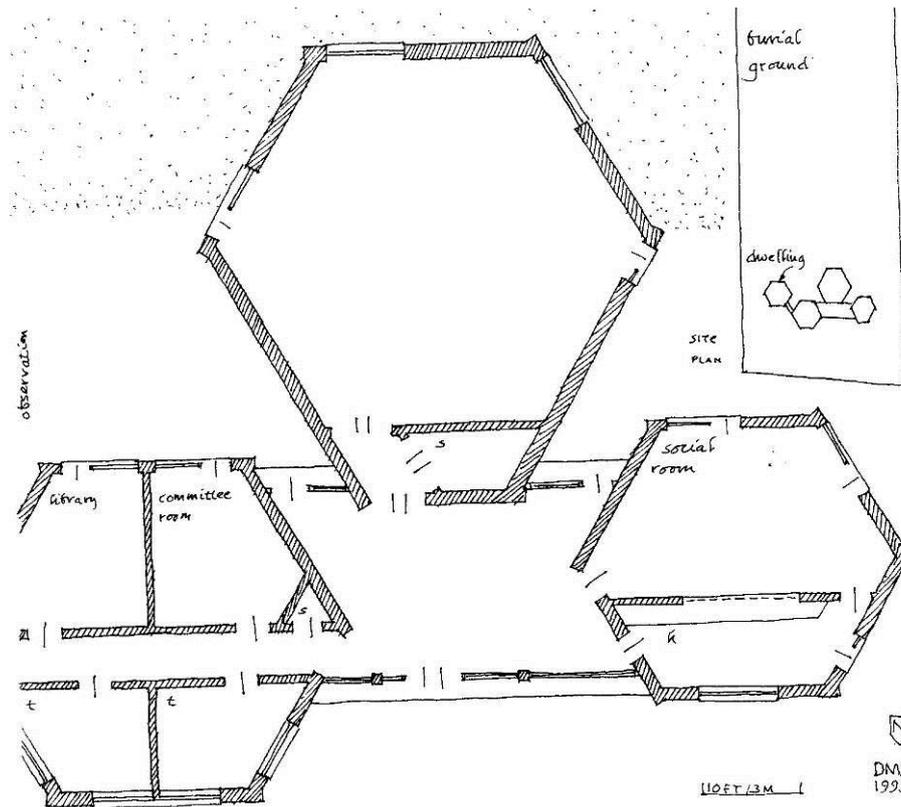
The ground plan of the building from *Butler* vol 1 p.203.
